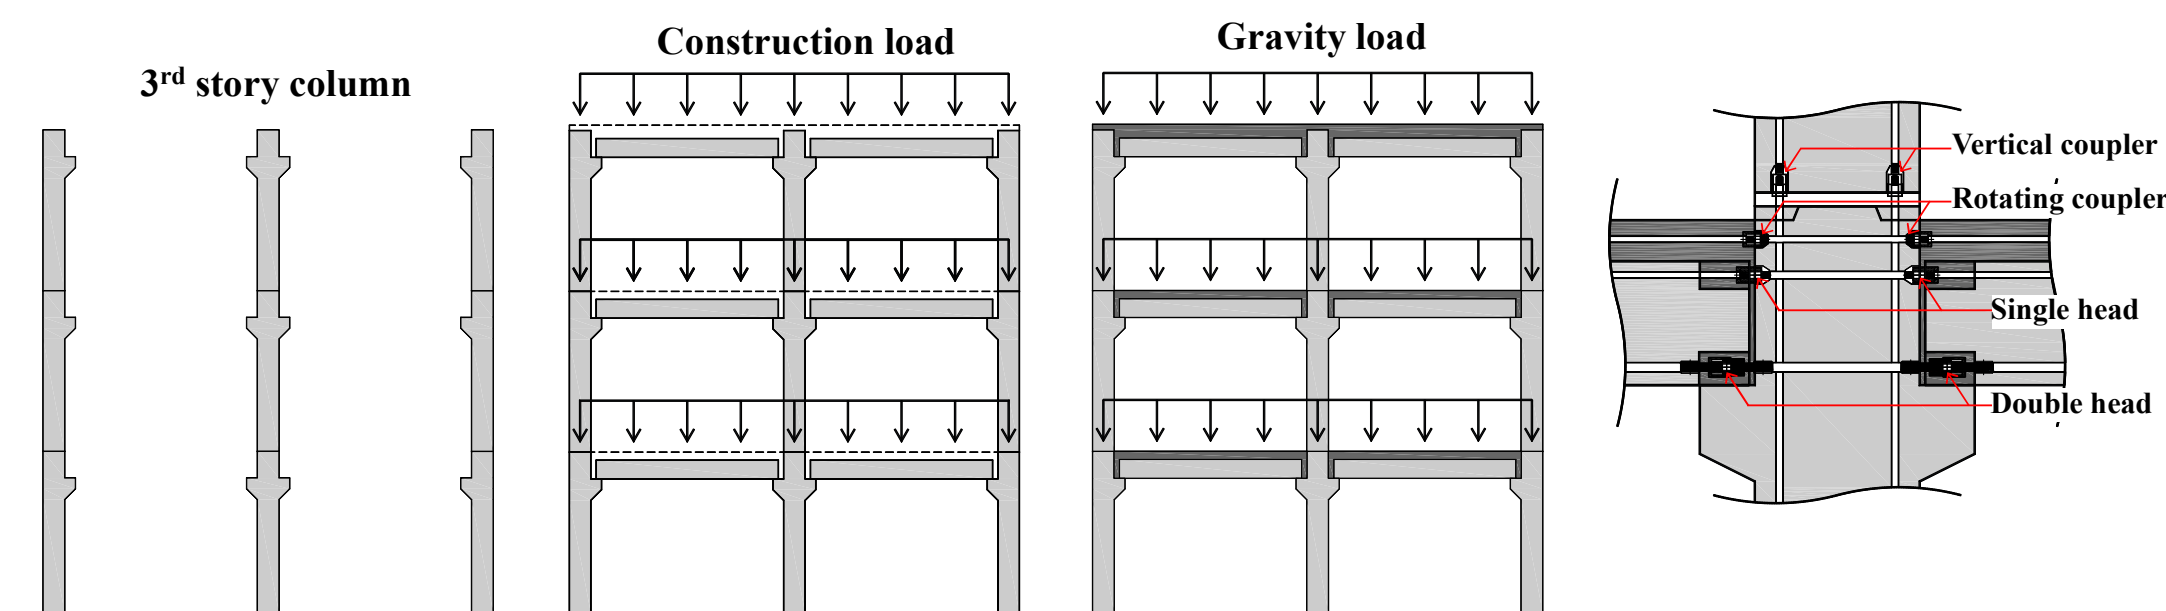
Fast-built construction process of SSS dry PC moment frame
